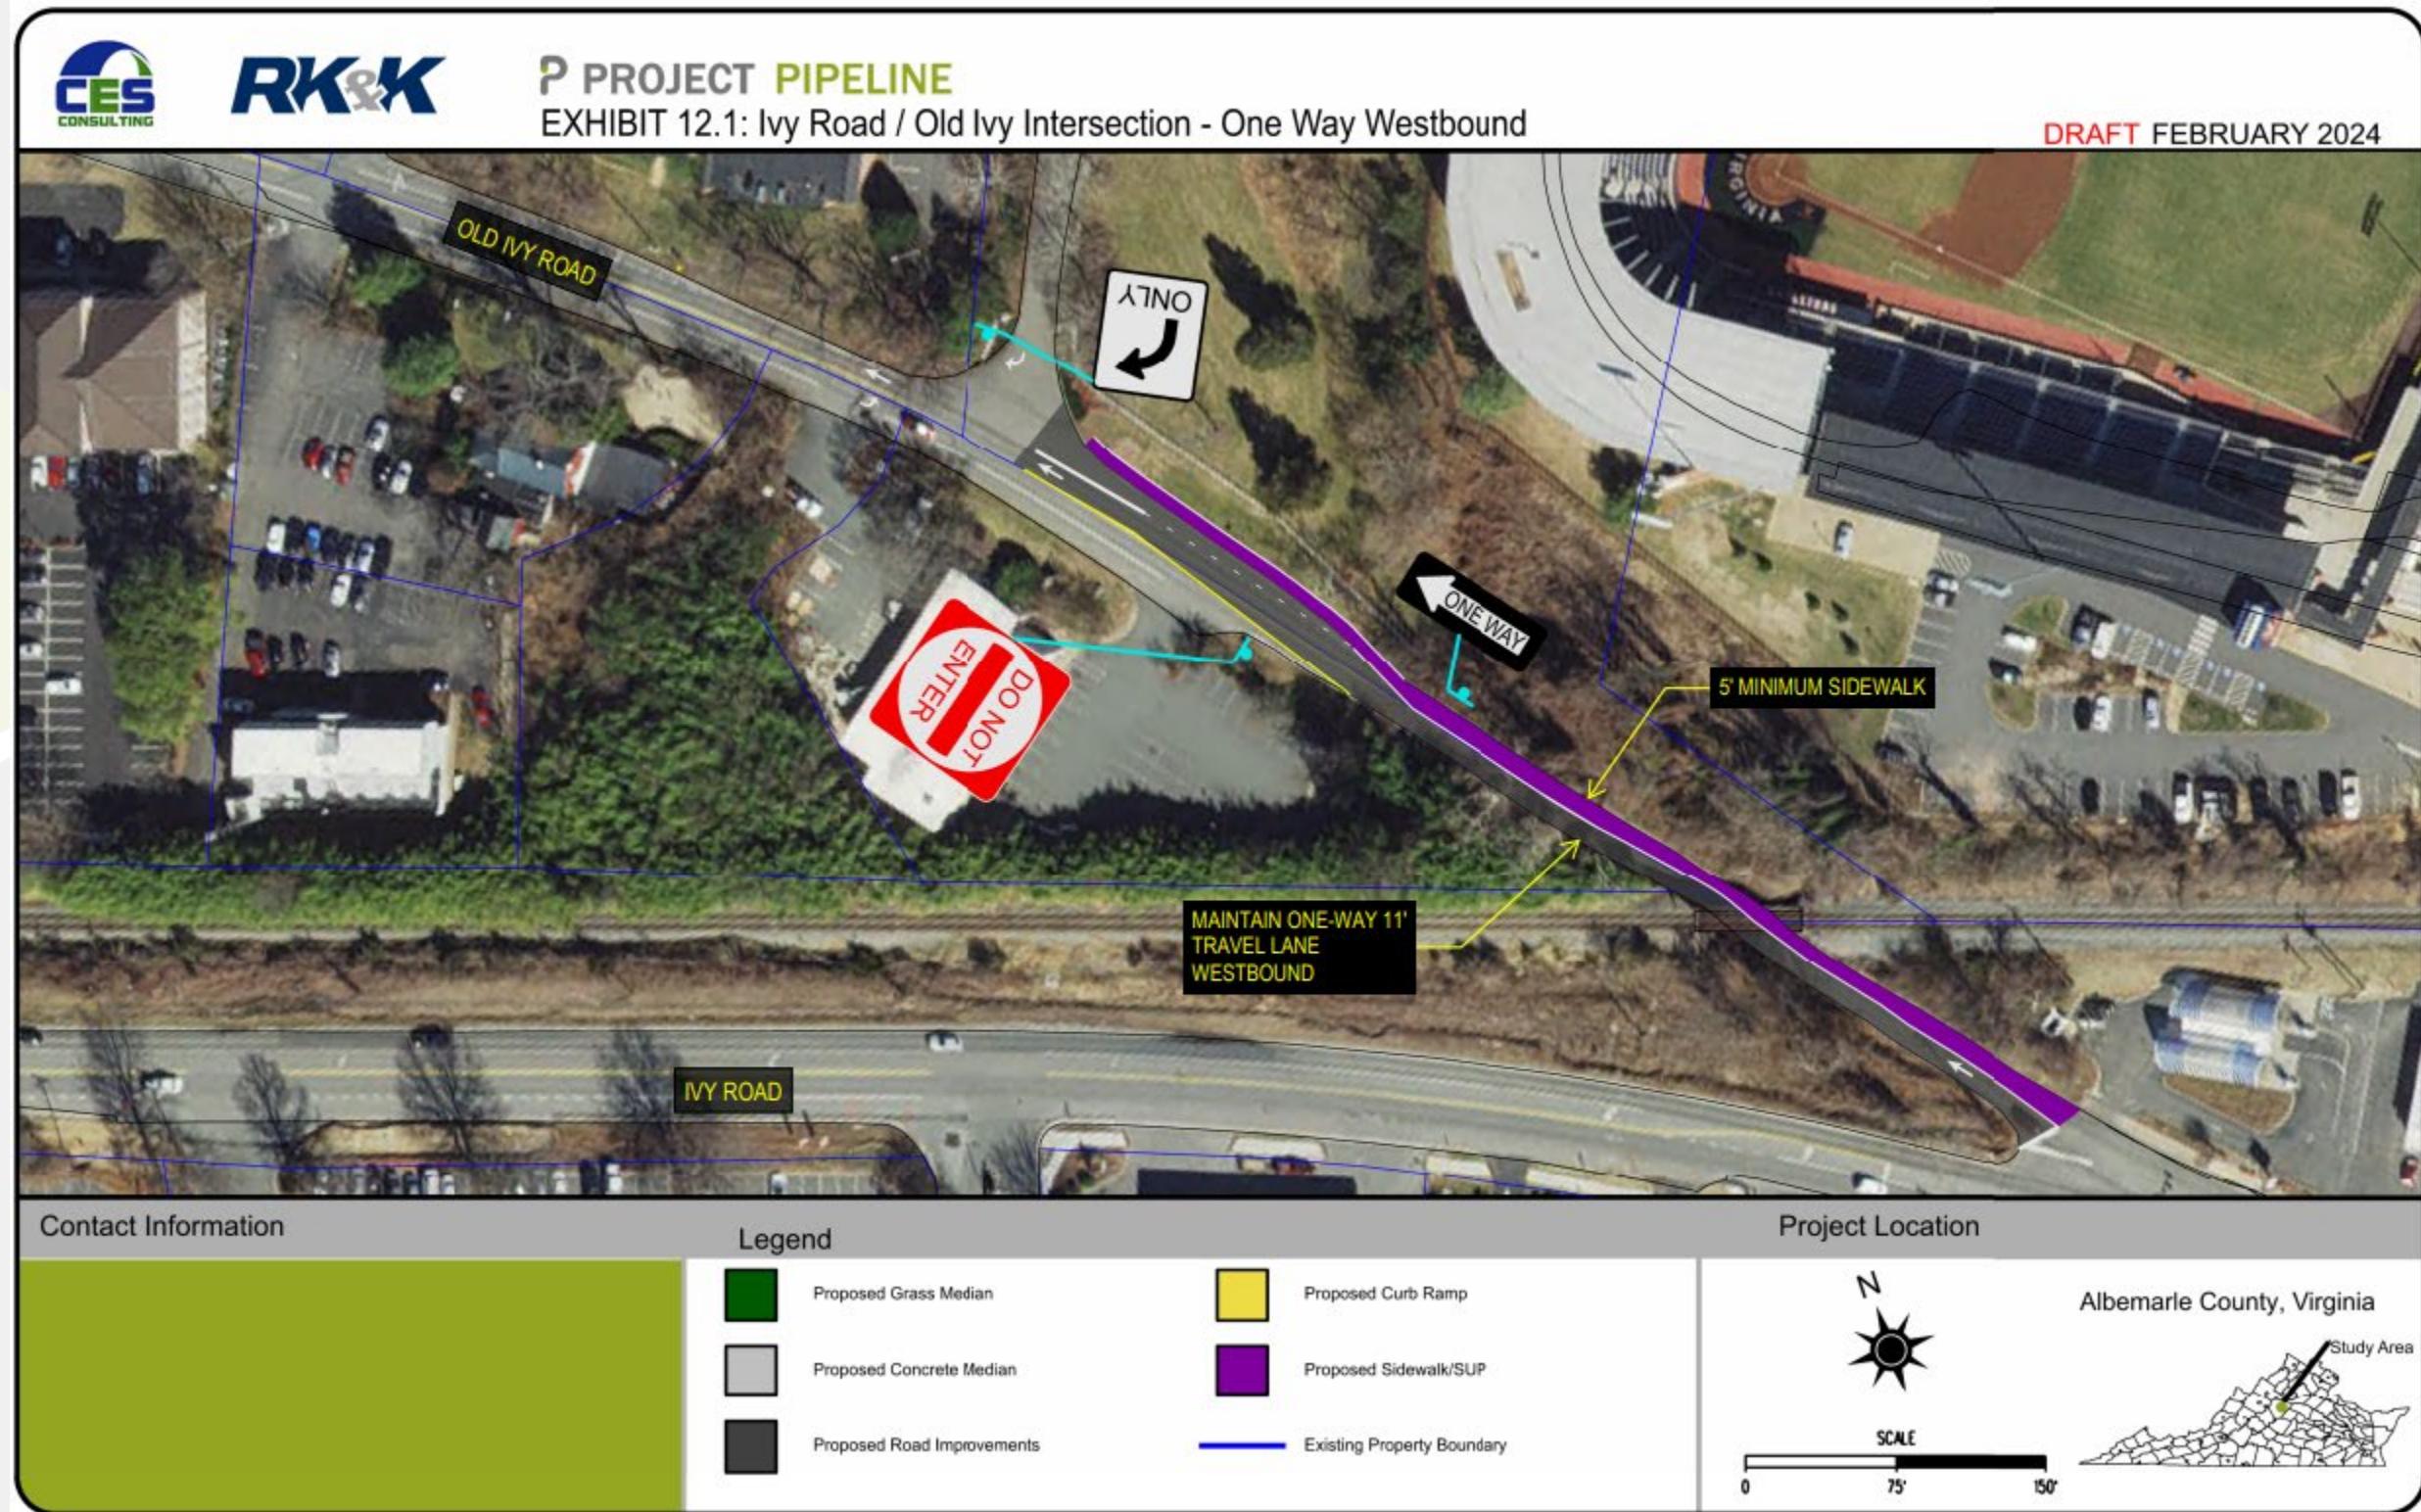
Ivy Road – Layout for Old Ivy Road – Shared Use Path (1 of 3)
